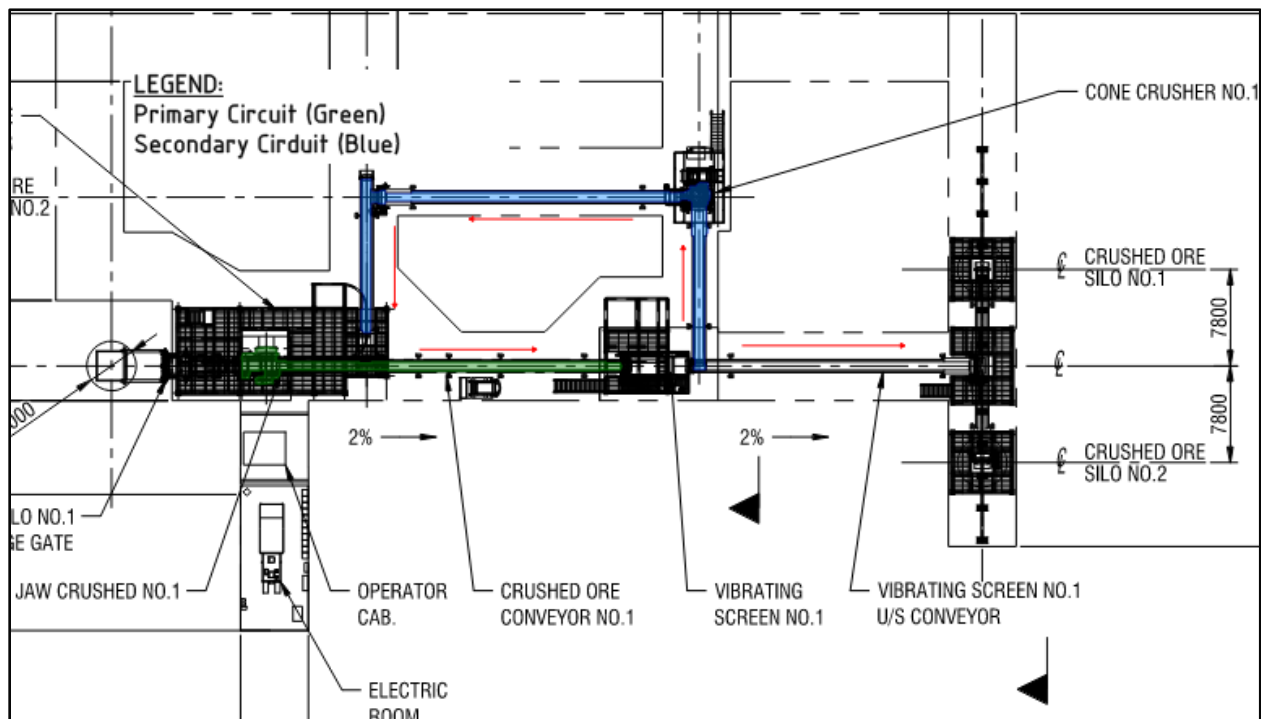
Plan view U/G (“underground”) closed loop crushing station
